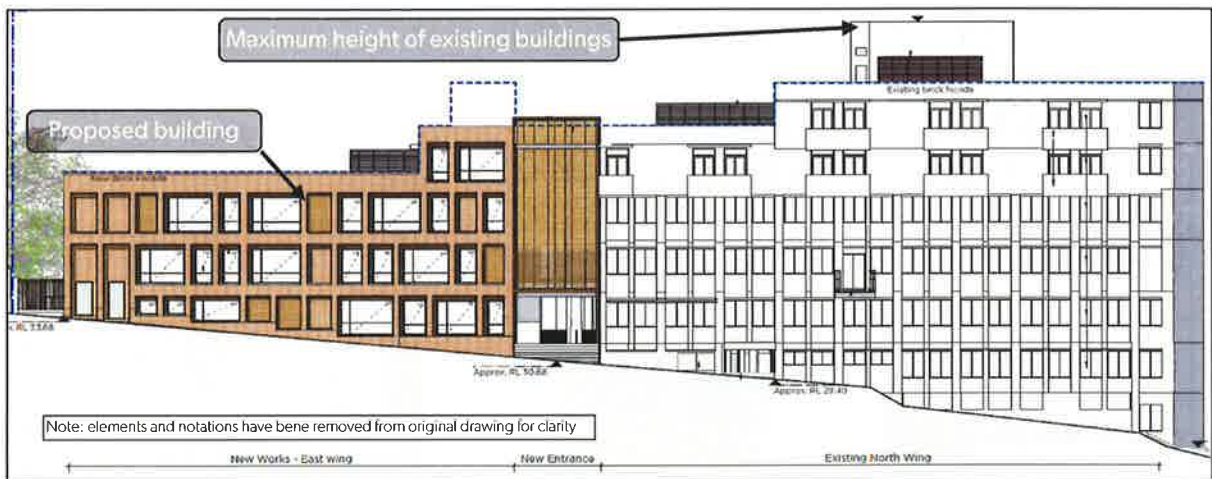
| Northern elevation of the replacement north-east wing building on the Main Campus (Source: Applicant's RtS 2018)
